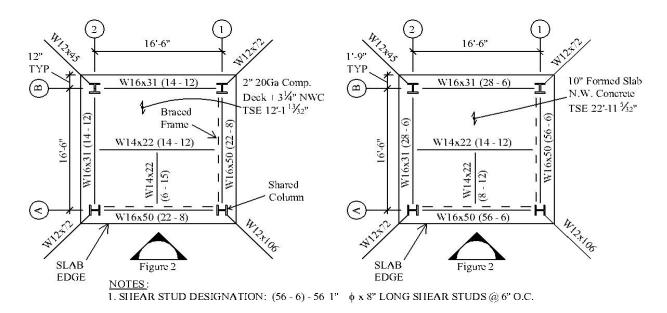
Test specimen floor plans: (a) second floor; (b) third floor plan
